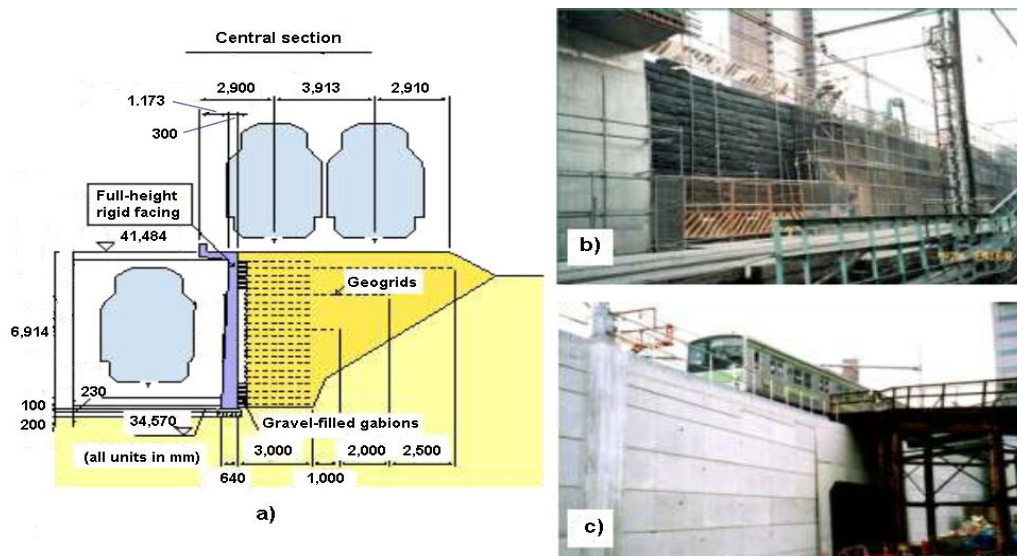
GRS-RWs having a FHR facing in Yamanote Line, a) Typical cross-section b) Wall under construction c) Completed wall, (after Palmeira et al., 2008)
